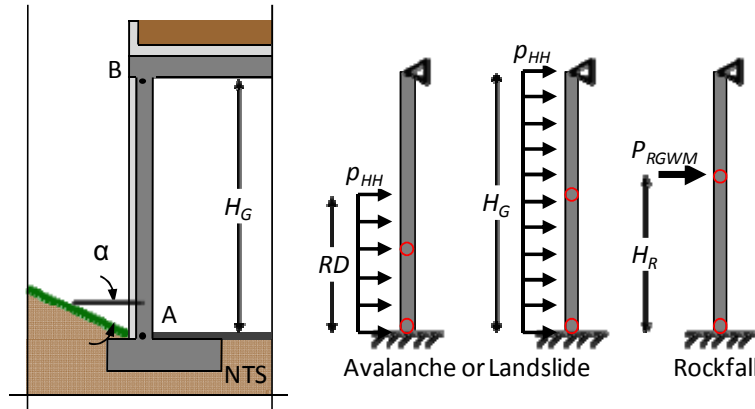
Gallery wall loading and potential flexural hinge locations.
